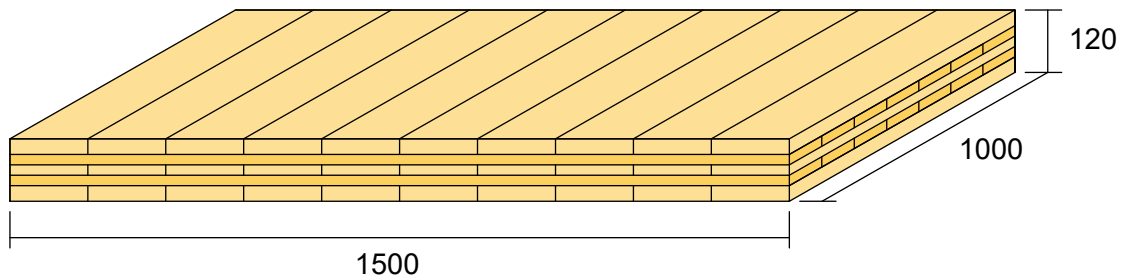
Geometry of the test specimen. Dimensions in mm.
